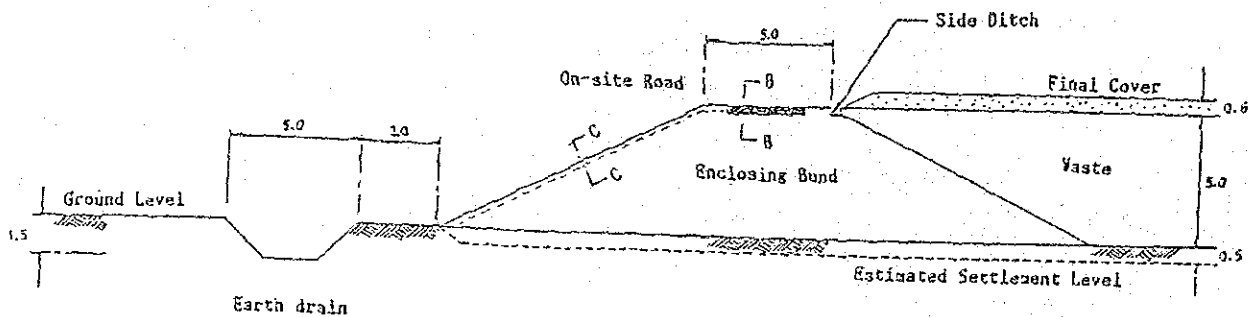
Typical Cross Section of Surrounding Drain
